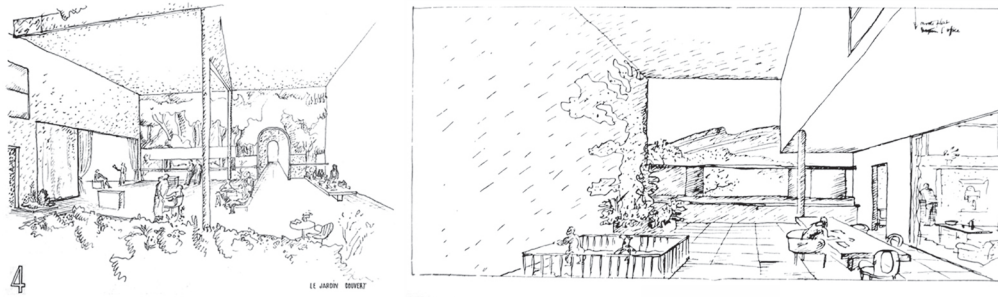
e 3b - Meyer house and Wanner building, visual and / or physical conduit of suspended garden to the surroundings.
